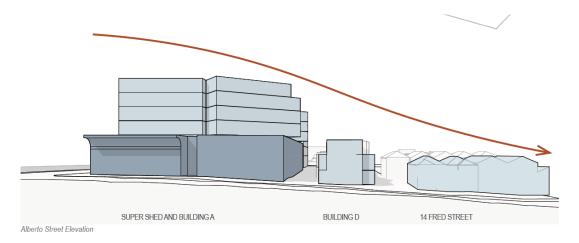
Alberto Street Elevation Diagrammatic Elevation and Transition
